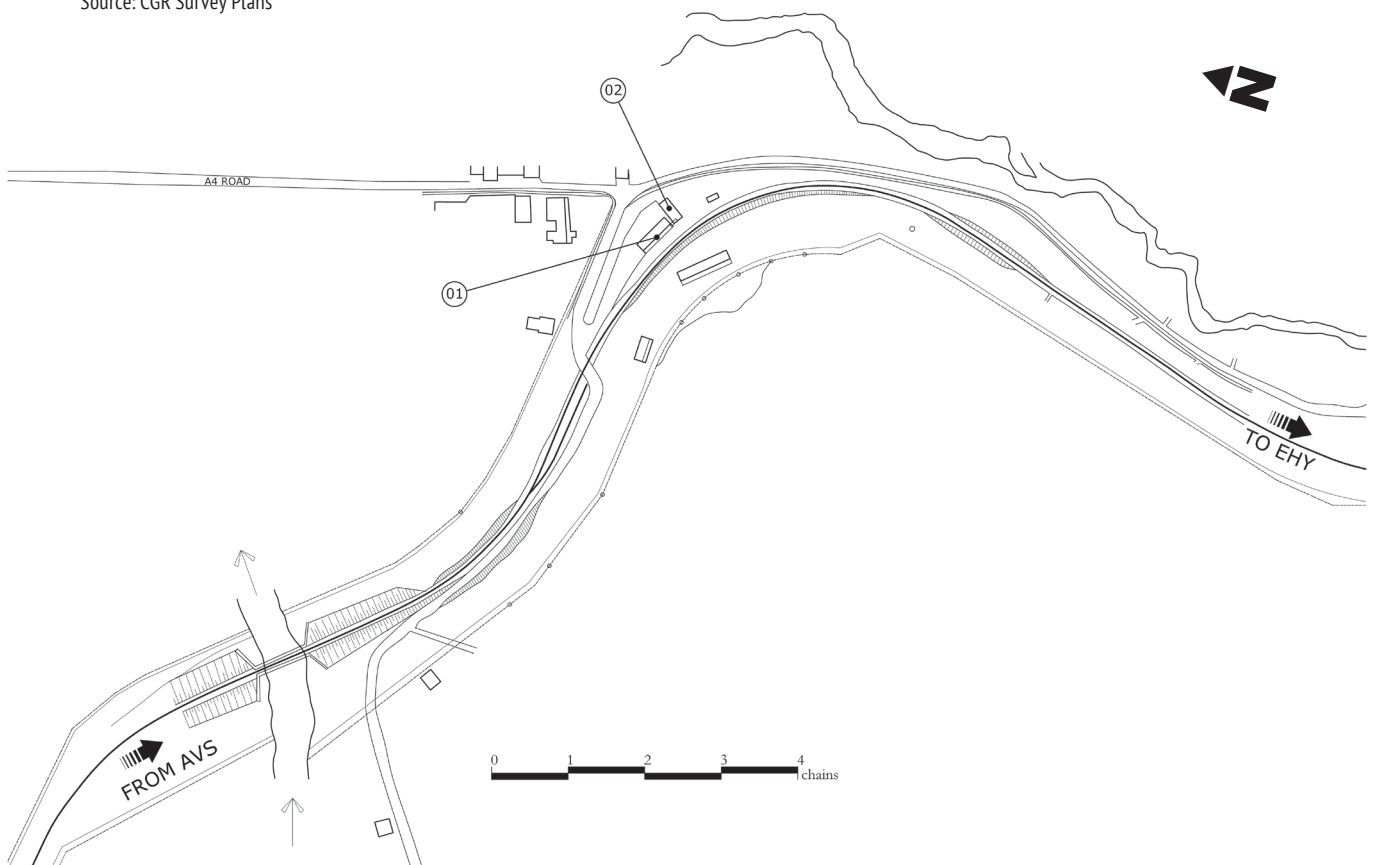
Survey Plan of Avissawella Station, 1944
